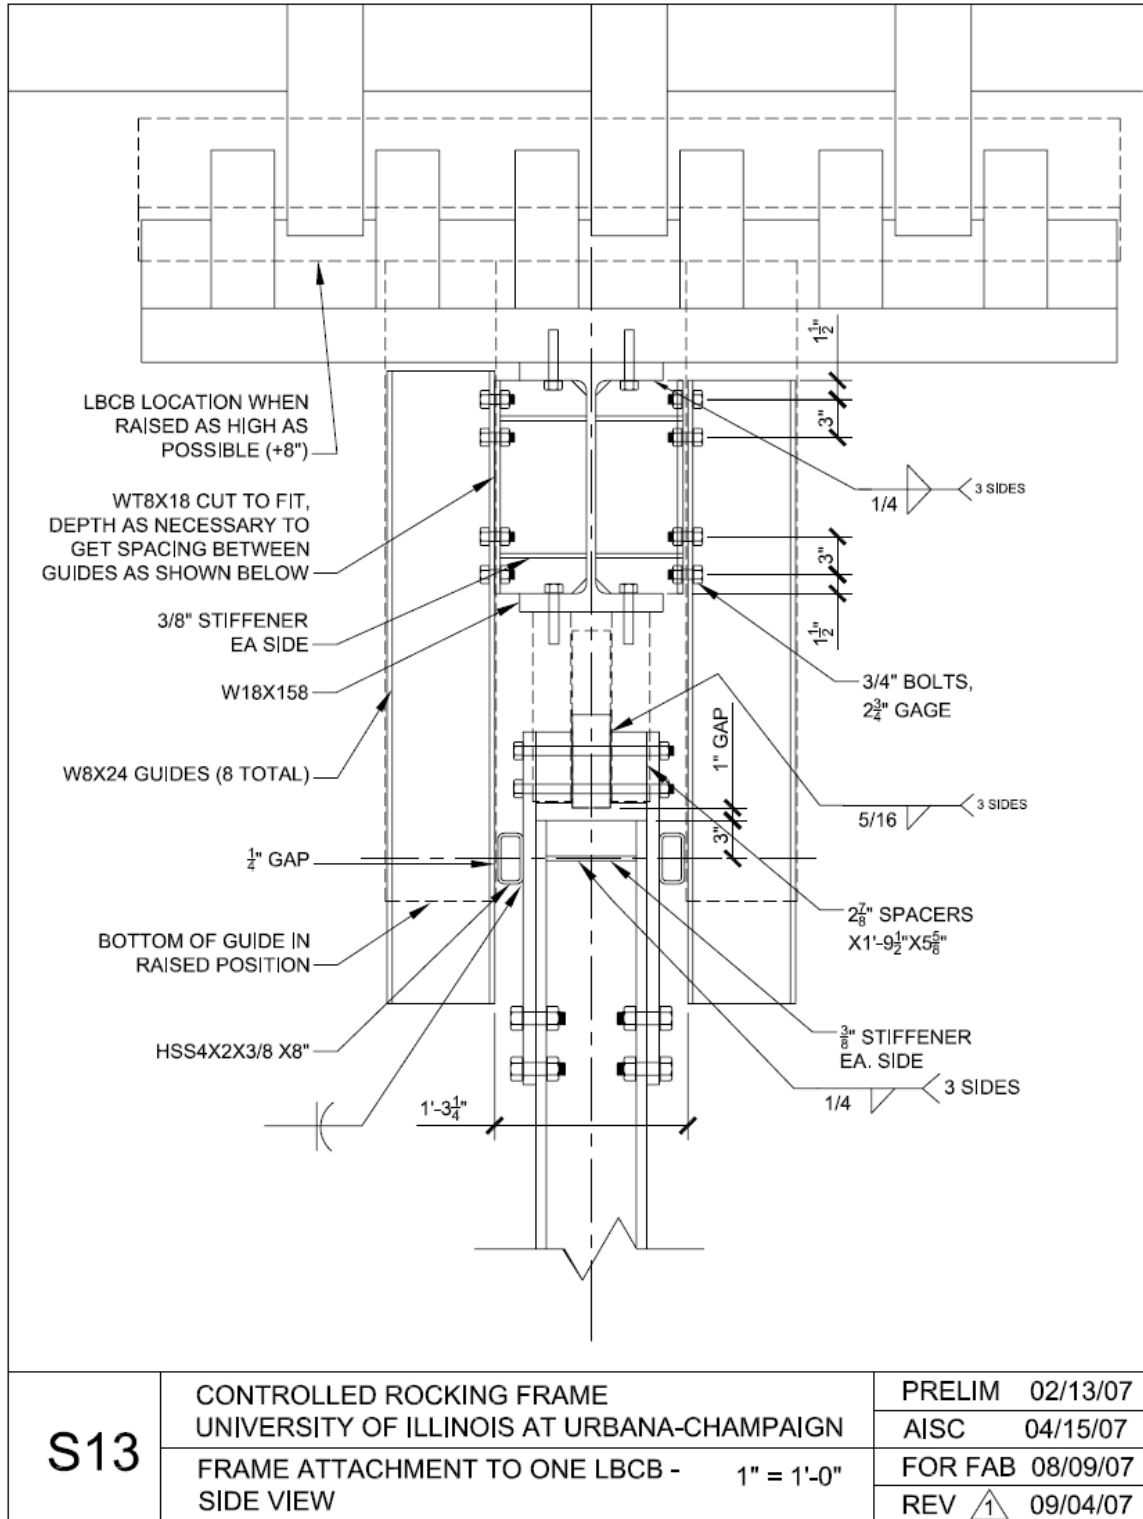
Specimen Design Drawing – Frame Attachment to One LBCB – Side View
